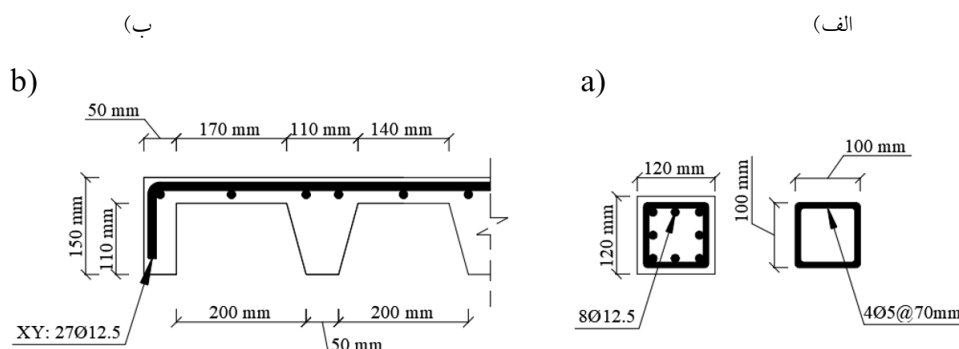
Dimensions and reinforcement details of the models: a) Column; b) Slab
